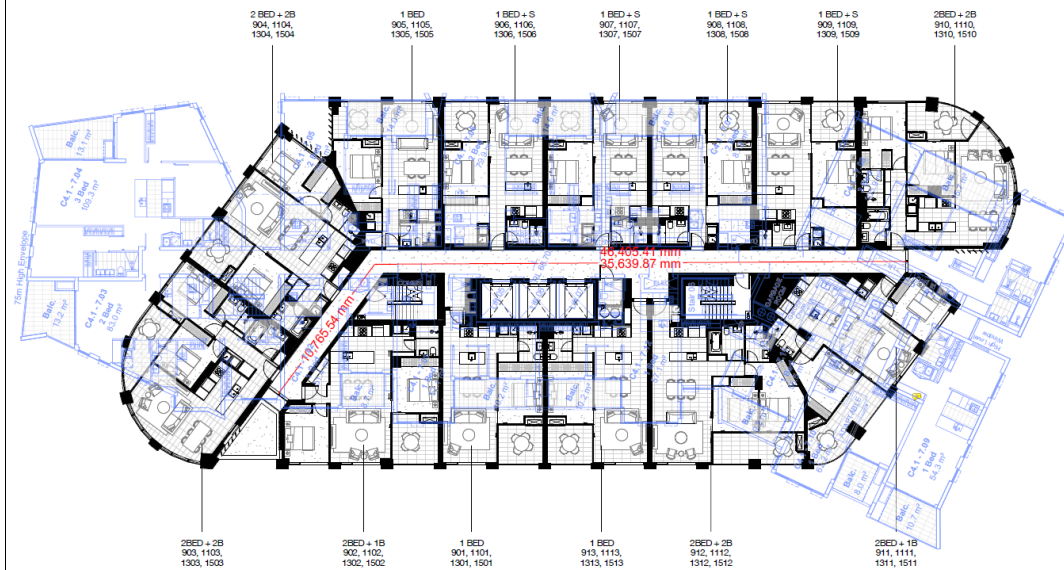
Overlay of the approved Building A1 and proposed Building C4
